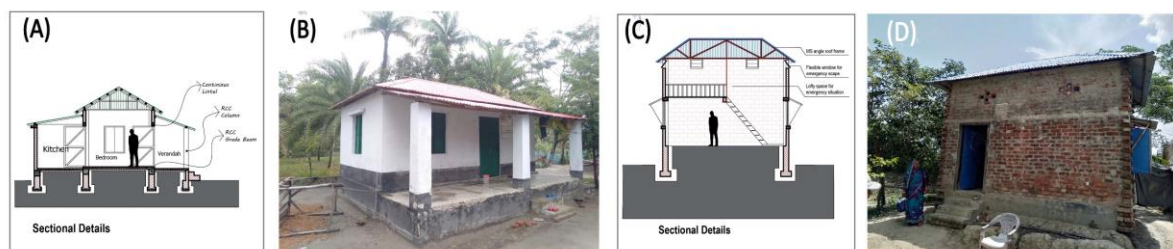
GoB provided modular house details (A, B), and UNDP provided modular house details (C, D)
